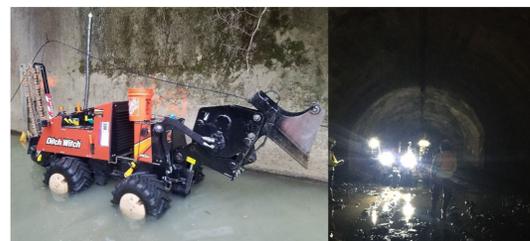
Photos of Ditch-Witch used for cable installation (left) and culvert interior during cable installation (right).
